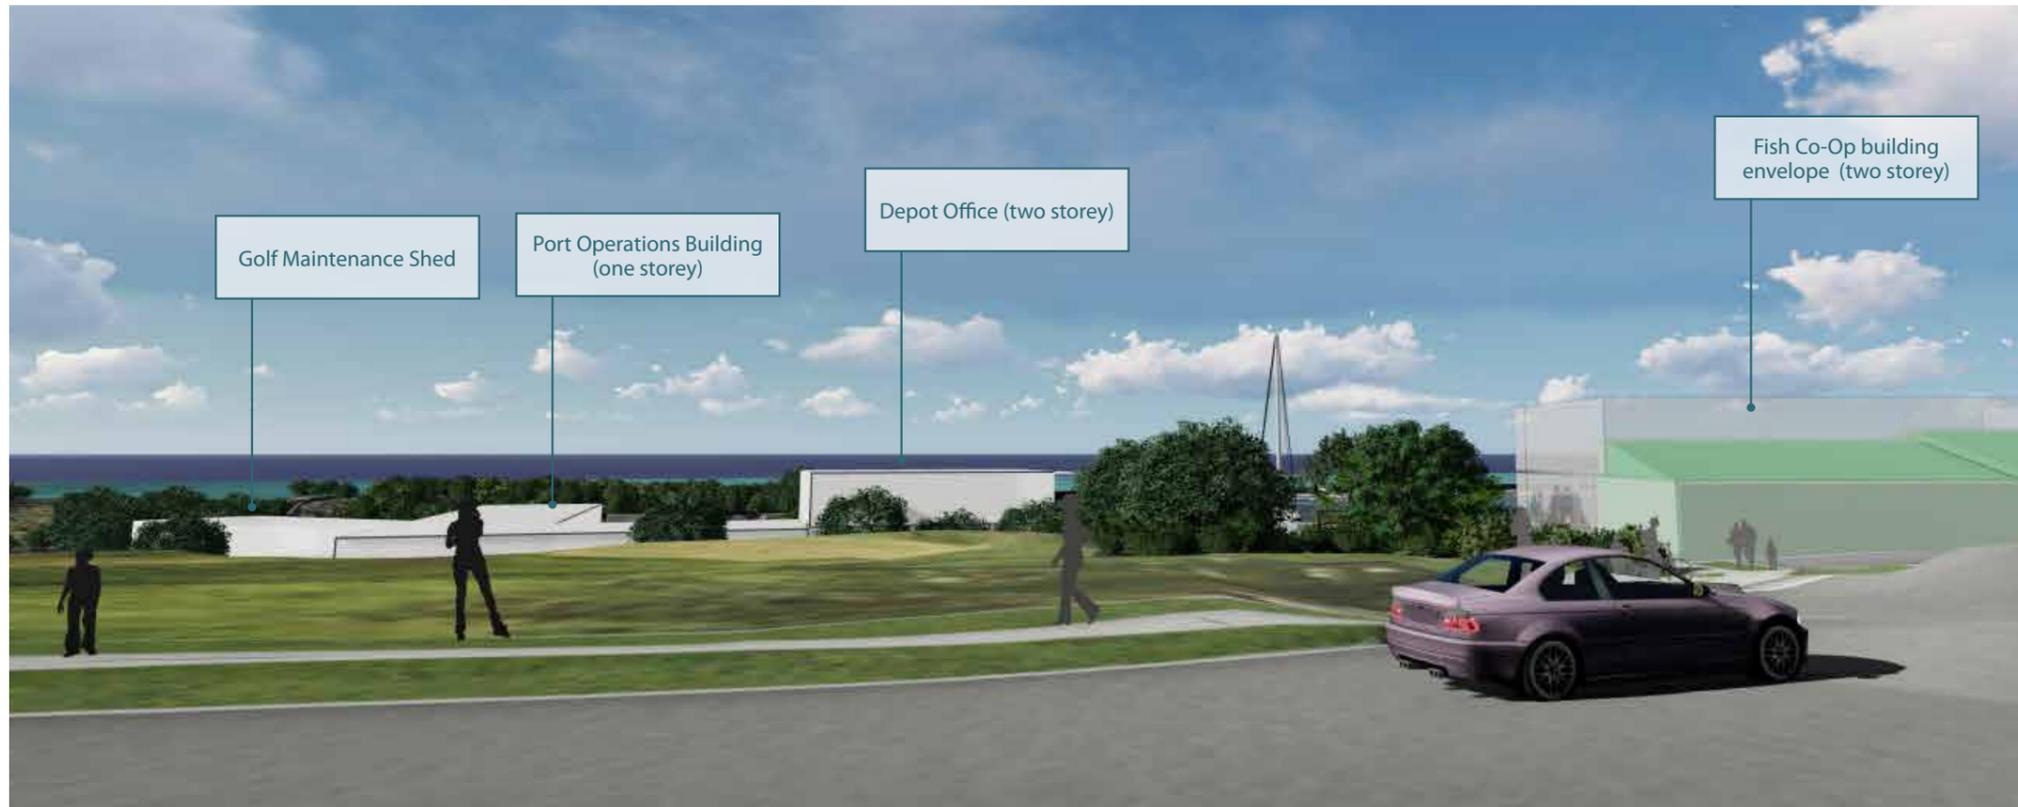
View 3 - Proposed Built Form Illustration - Trafalgar Street / Breakwater Road Intersection View North East
